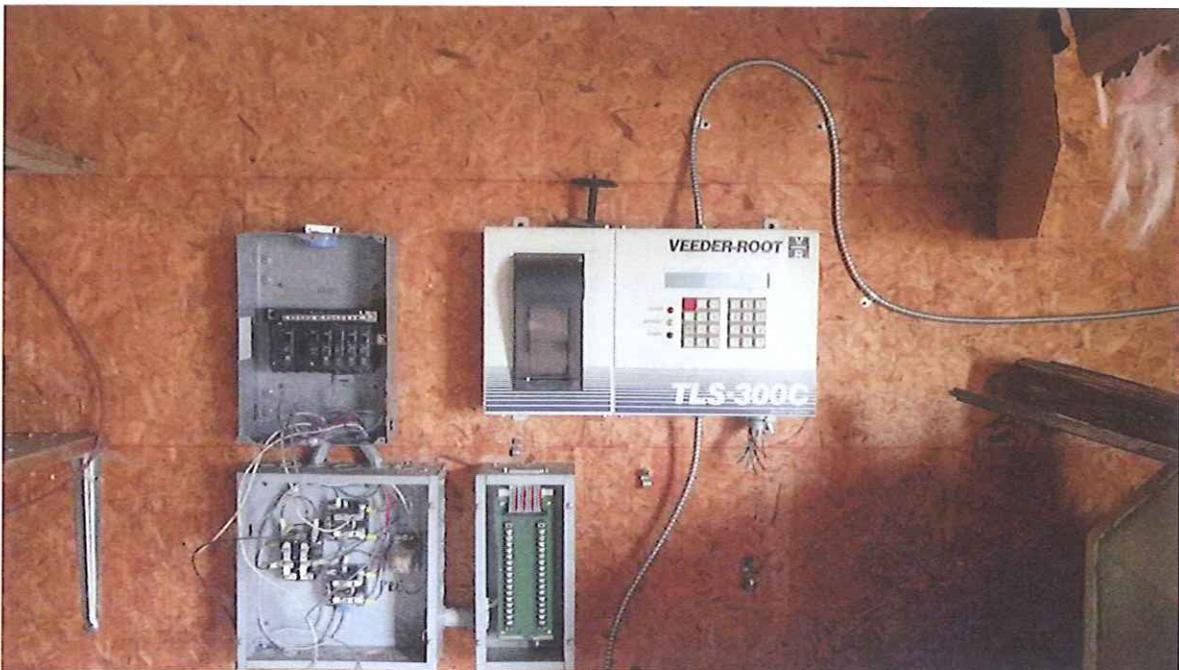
View of Veeder-Root tank monitor located inside of Subject Property building.
